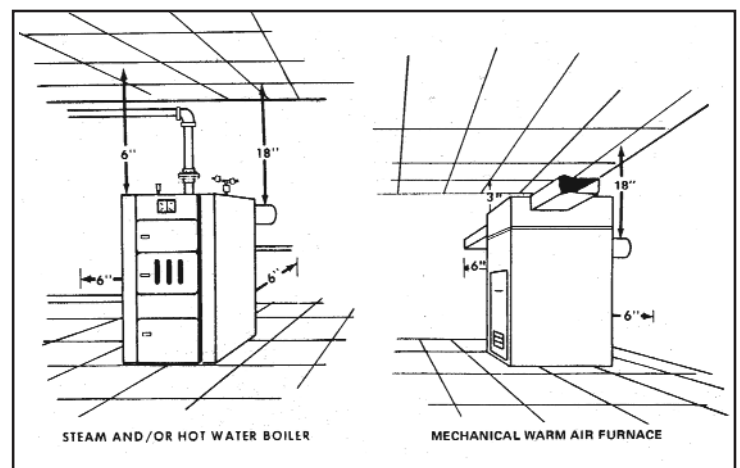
Minimum Clearance for Steam or Hot Water Boiler and Mechanical Warm-air Furnace [4]
